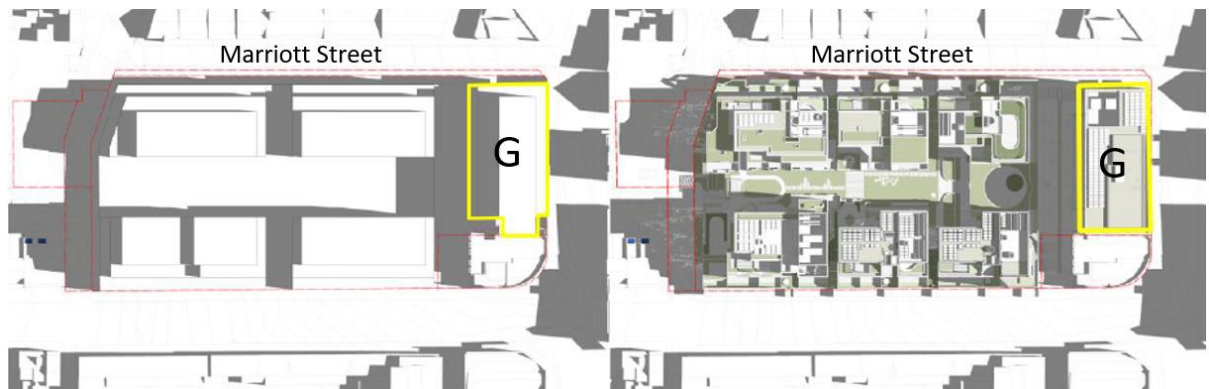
Building G DCP envelope (left) and Building G proposed (right) at 11:00am, winter solstice.
